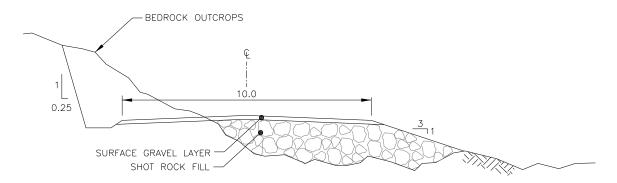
Typical Road Cross Section on Bedrock (Terrain Type 5)
